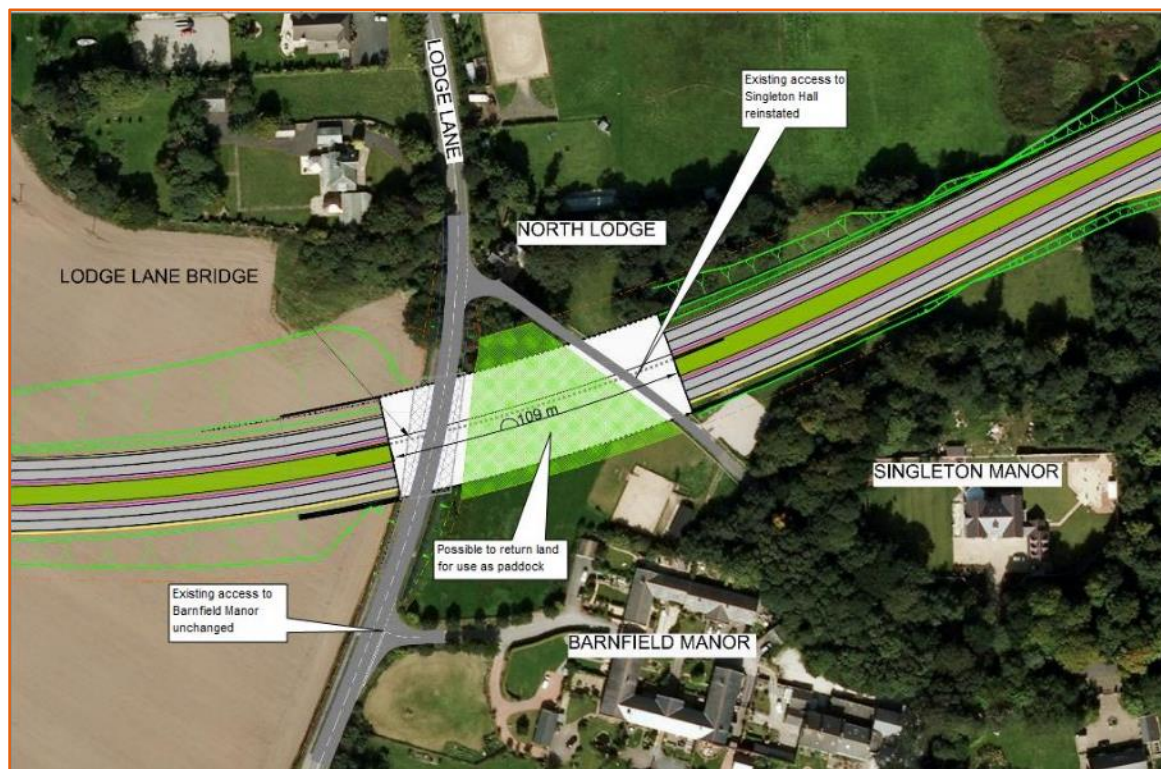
Lodge Lane Land Bridge alternative (C)
